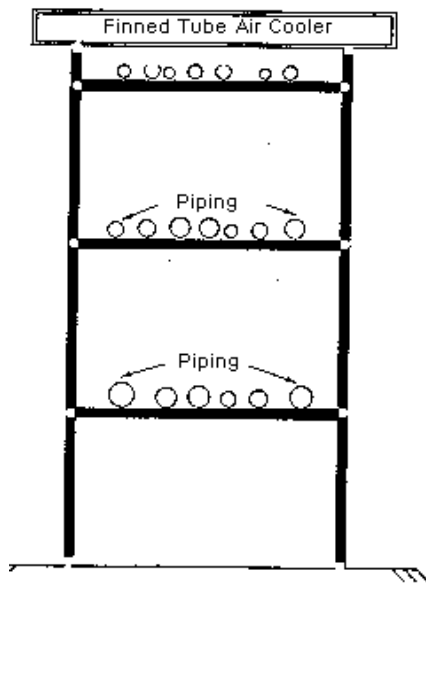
, Pipe Rack Supporting Finned Tube Air Cooler (End View)
